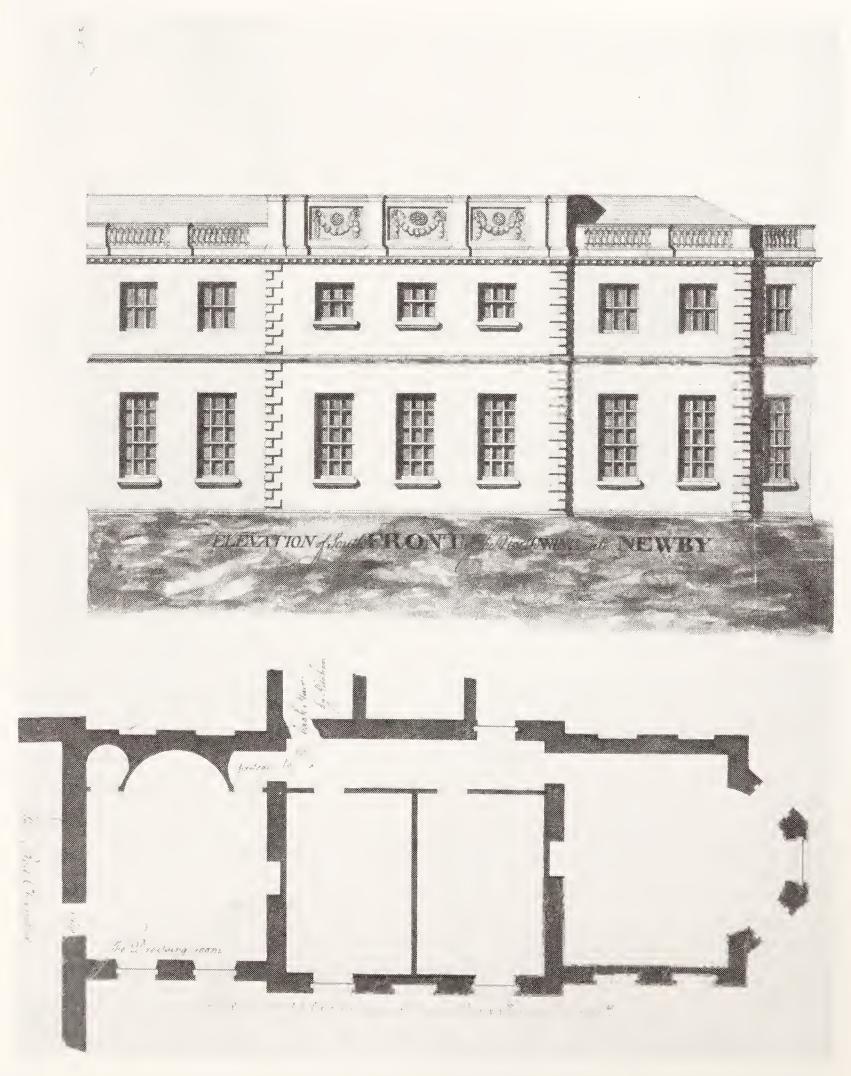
William Belwood, plan of the first floor of the north wing and 'ELEVATION of South FRONT of the North WING at NEWBY', c.1775.
